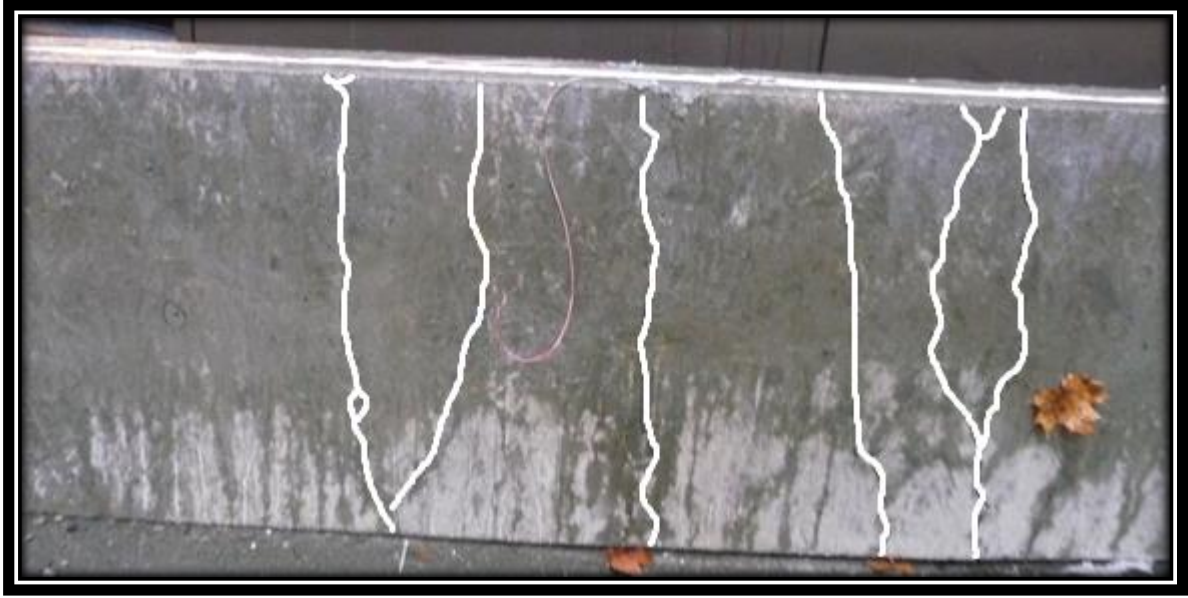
Discrete Connector Specimen 2—Crack Pattern (Bottom of Specimen)
